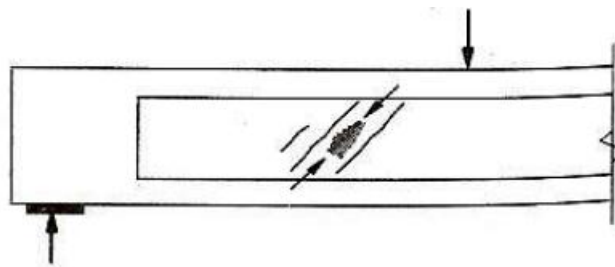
Shear failure due to diagonal tension crack (Dinh, 2009)
